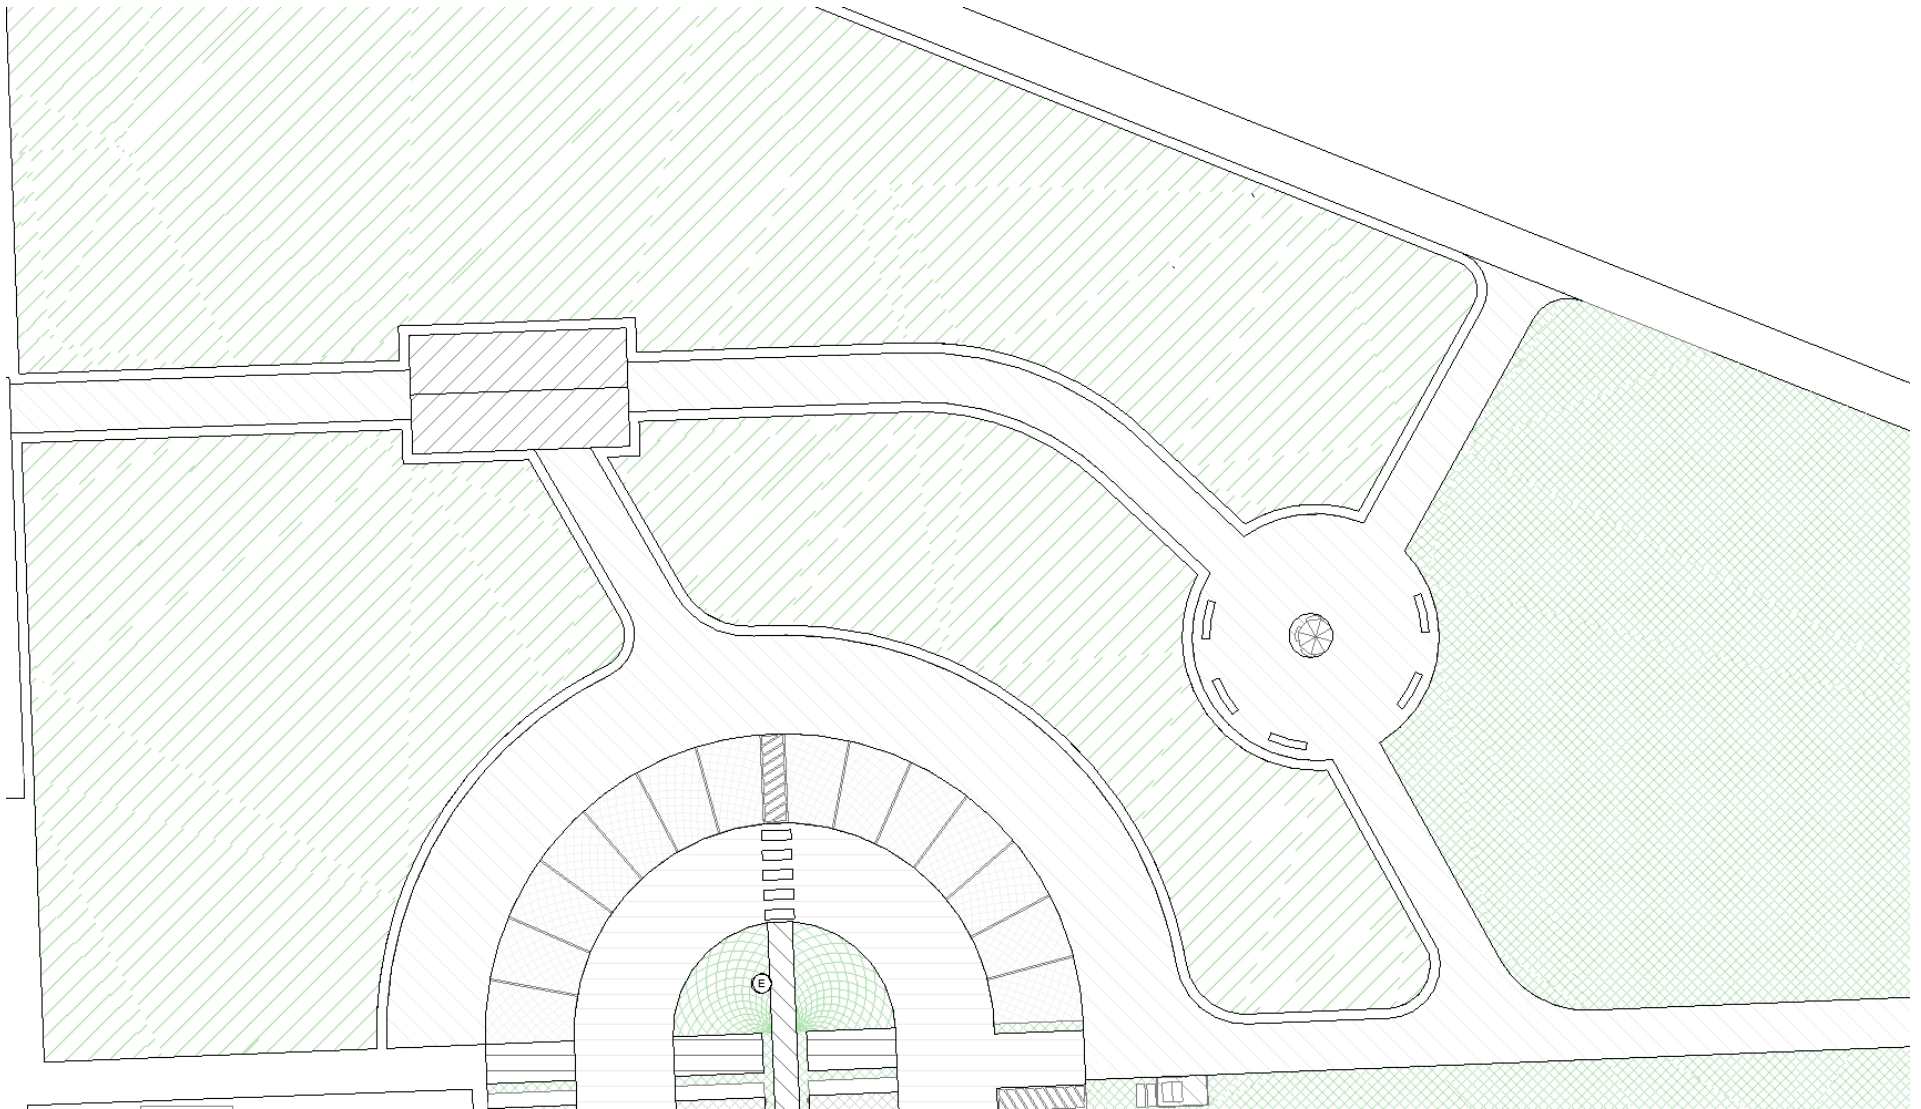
Plan view of the pavilion structure at the existing intersection between trail arms with seating for 36 at picnic tables and standing room for 50 to accommodate events.
